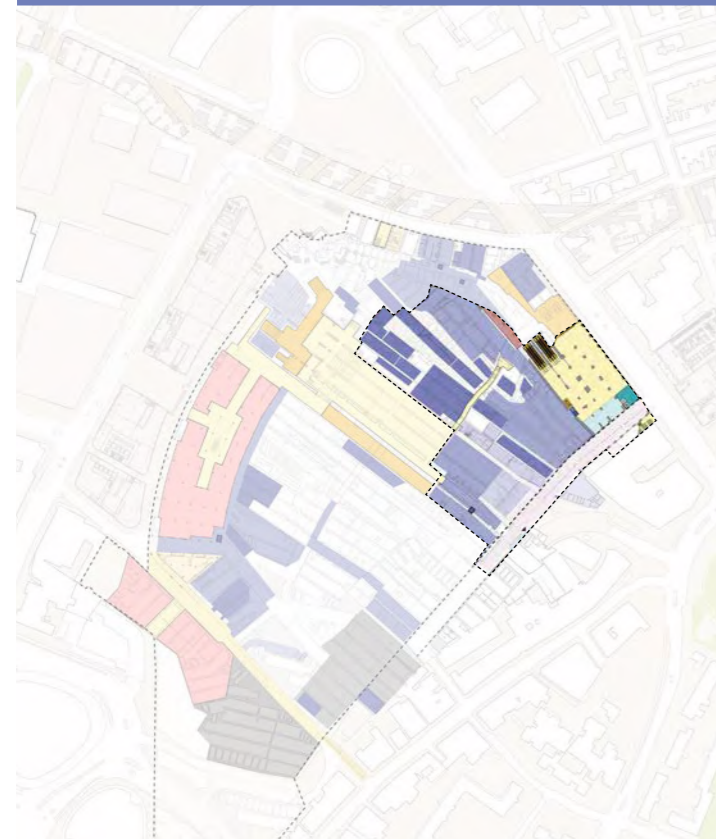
Grade / Undercrofts Level Sketch Plan
